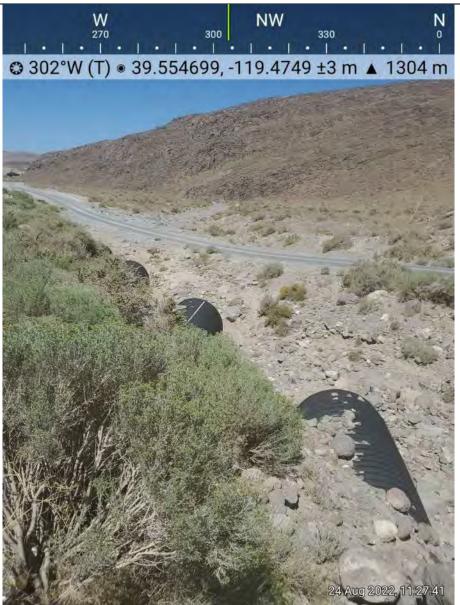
Looking downstream at AR 1 after culverts pass under Electric Avenue. Roadway constructed through AR 1 is privately owned and inaccessible. No evidence of flow across that roadway.
